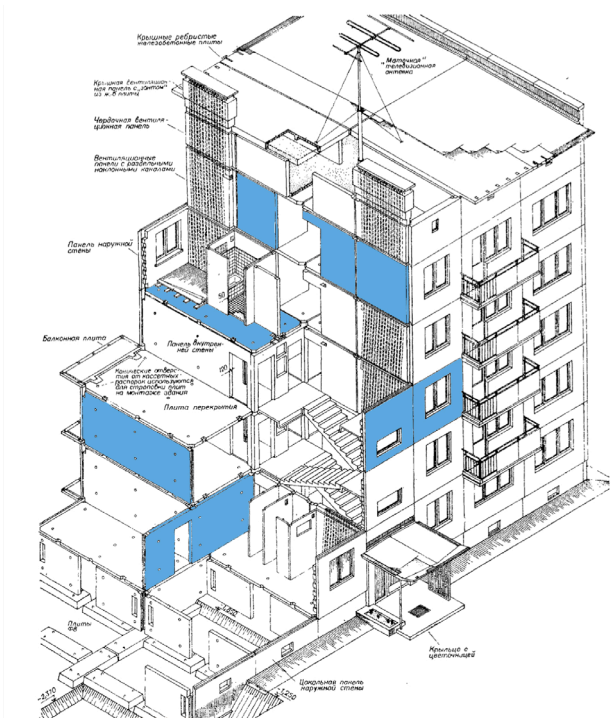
Axonometric Structural scheme. Longitudinal and every transverse walls [31]
